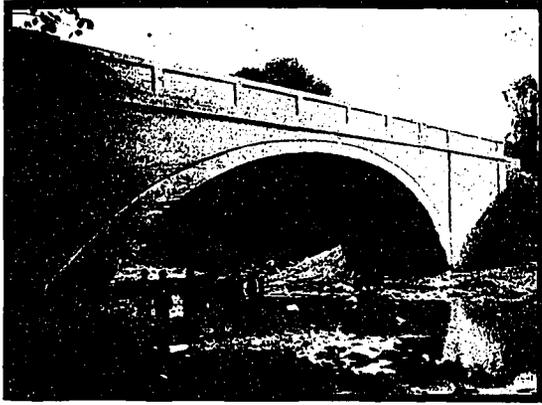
A Comparatively Plain but Pleasing Arch Bridge of 70 Feet Span at Kirkham's Mills, Township of Scarborough. This is a Type of Permanent Structure Suited to Rural Situations where the Foundations and the Rise are Satisfactory. Barber & Young, Engineers.
